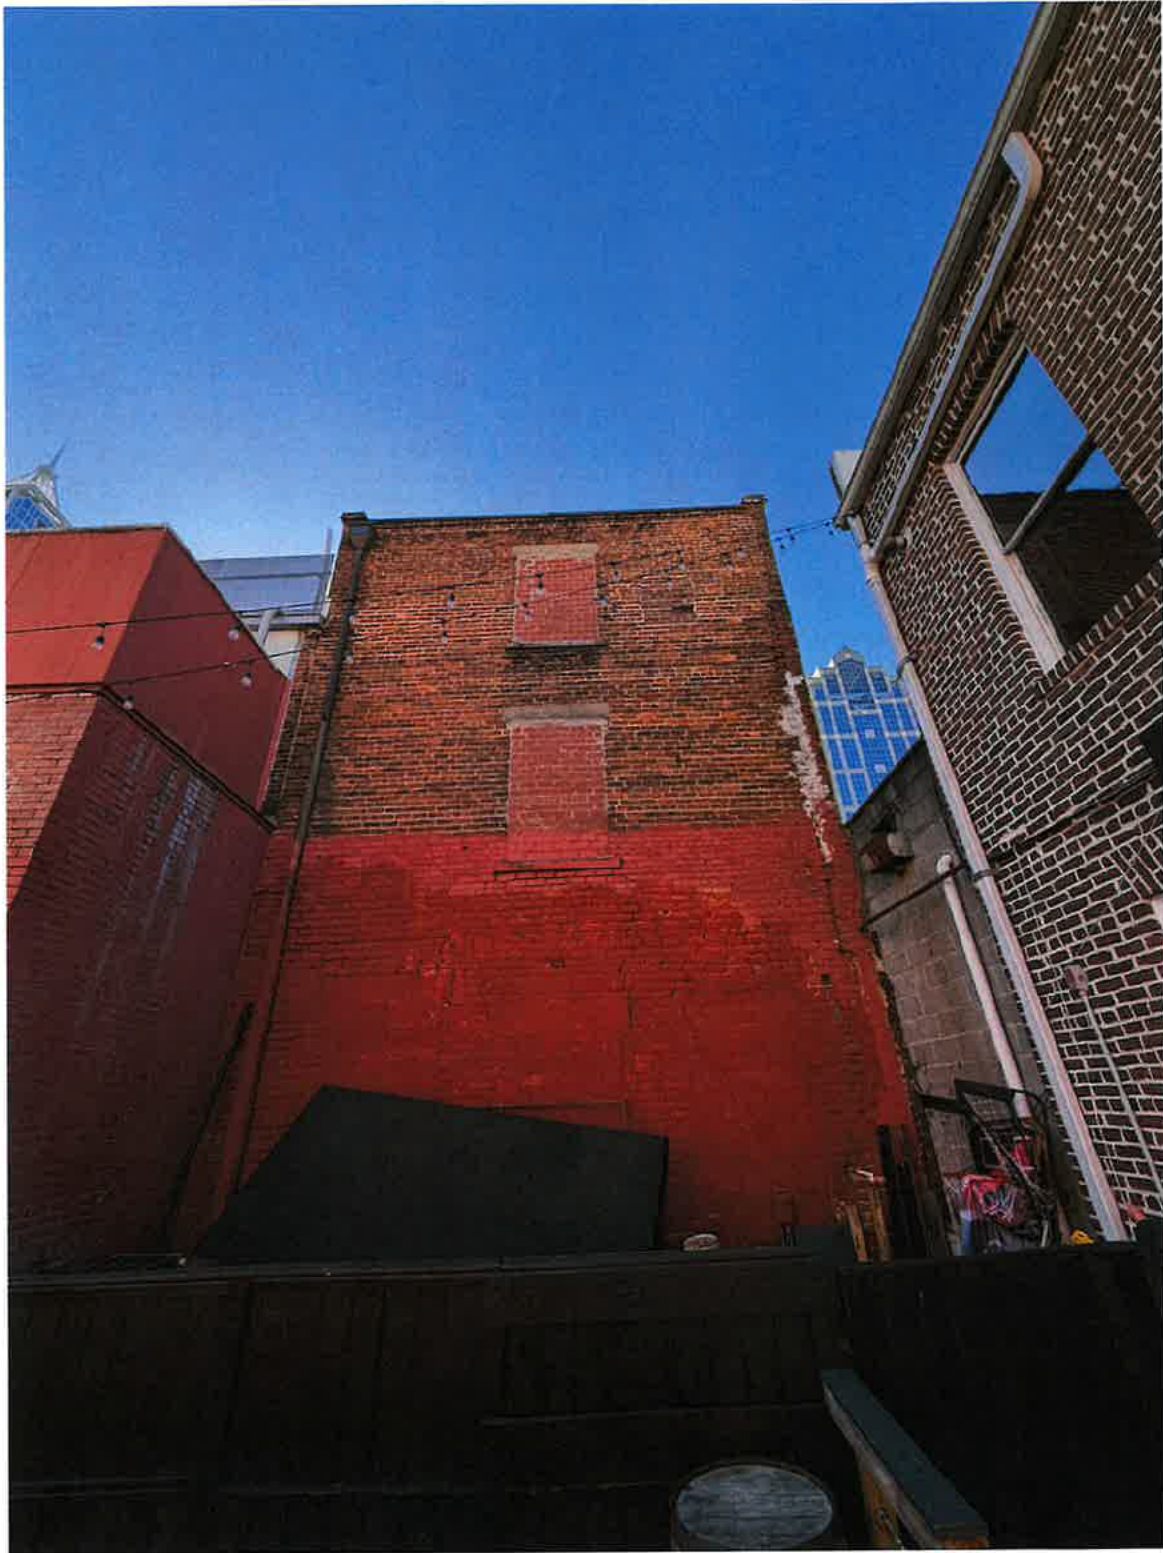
209 S Wilmington St. Raleigh, NC (03/19/2026) Rear Façade with bricked in window openings.
